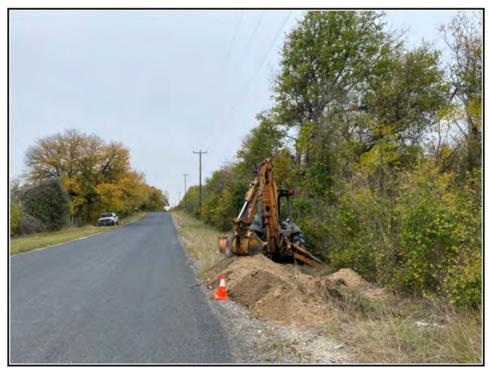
Excavation of BHT 1 in northern portion of project area on the second alluvial terrace. Note slight elevation rise in background up to Terrace 3. Photo taken facing south.
